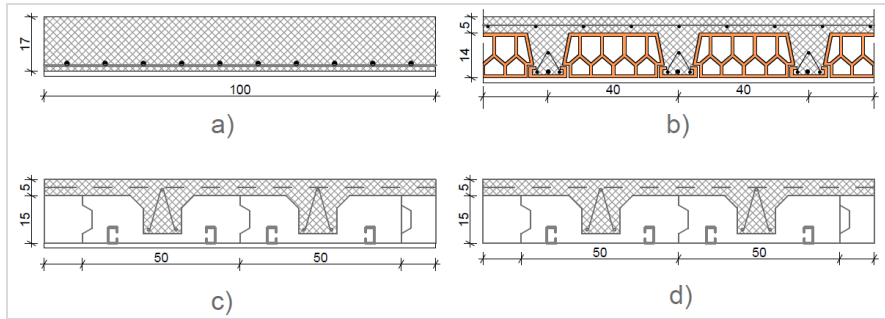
Different types of floor structures: a) RC slab; b) slab system FERT; c) slab system STIRODOM with plasterboard as thermal insulation; d) slab system STIRODOM
